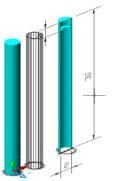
Geometric specification of supposed concrete minaret with fixed support
